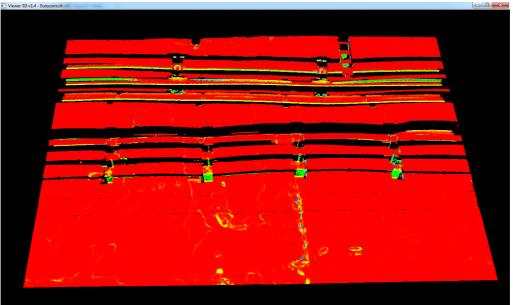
Cracking example. Tower Hill – Monumet (TL32)
